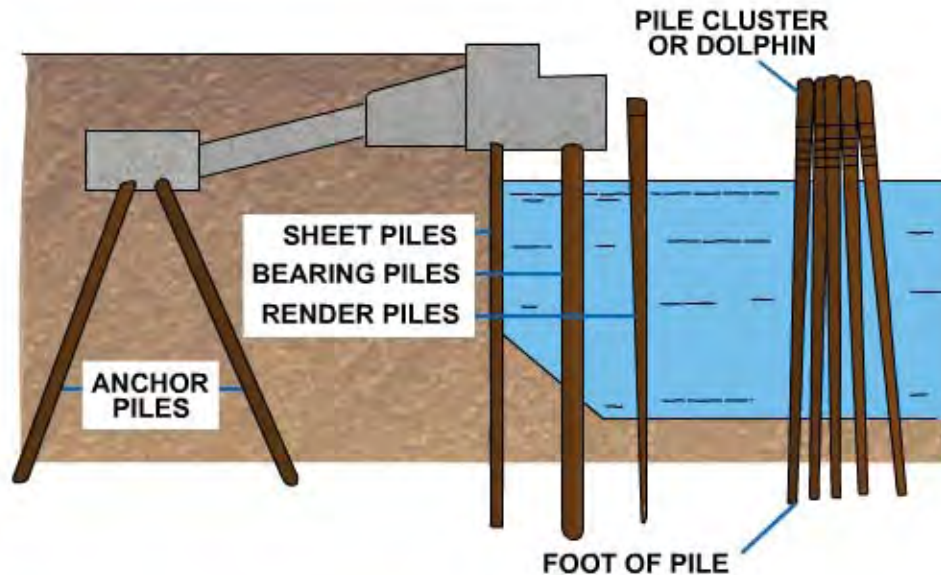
Typical uses of piles driven in a waterfront structure.
